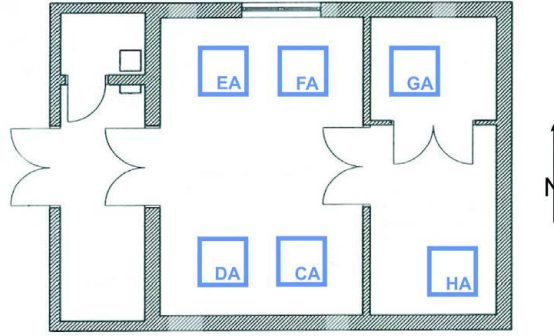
Floor plan of the new gravimeter house at Wettzell observatory by [111]. The SG-30 superconducting gravimeter was installed on pillar GA and GAIN was installed on pillar FA
